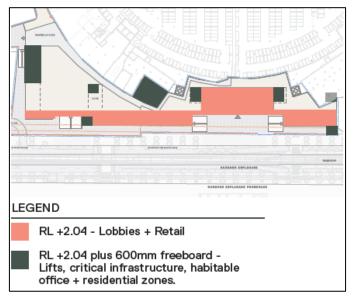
Master Plan consideration of flooding implication and how they can be addressed along Harbour Esplanade (source: Applicant's Master Plan)
